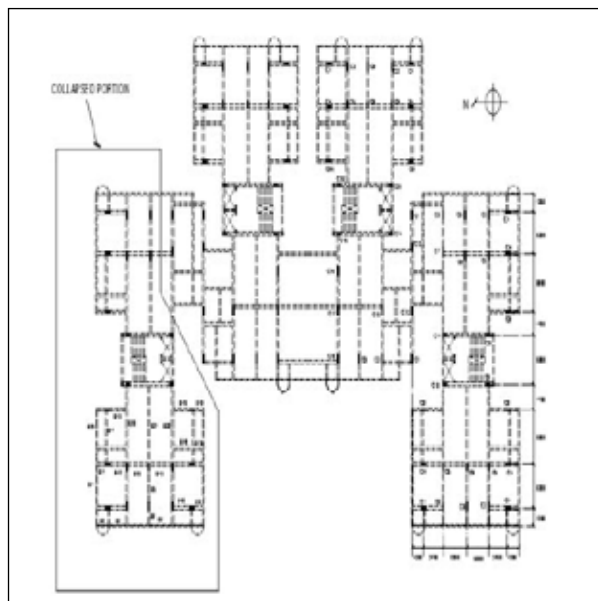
A plan of a typical RC frame building in Ahmedabad, India; note the portion that collapsed in the 2001 Bhuj earthquake (WHE Report 19, India)
